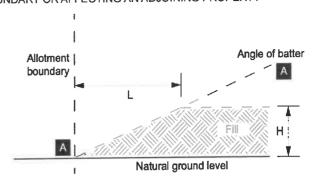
Site cut and fill using un-retained embankments — Site cut commencing at the allotment boundary or affecting an adjoining property
